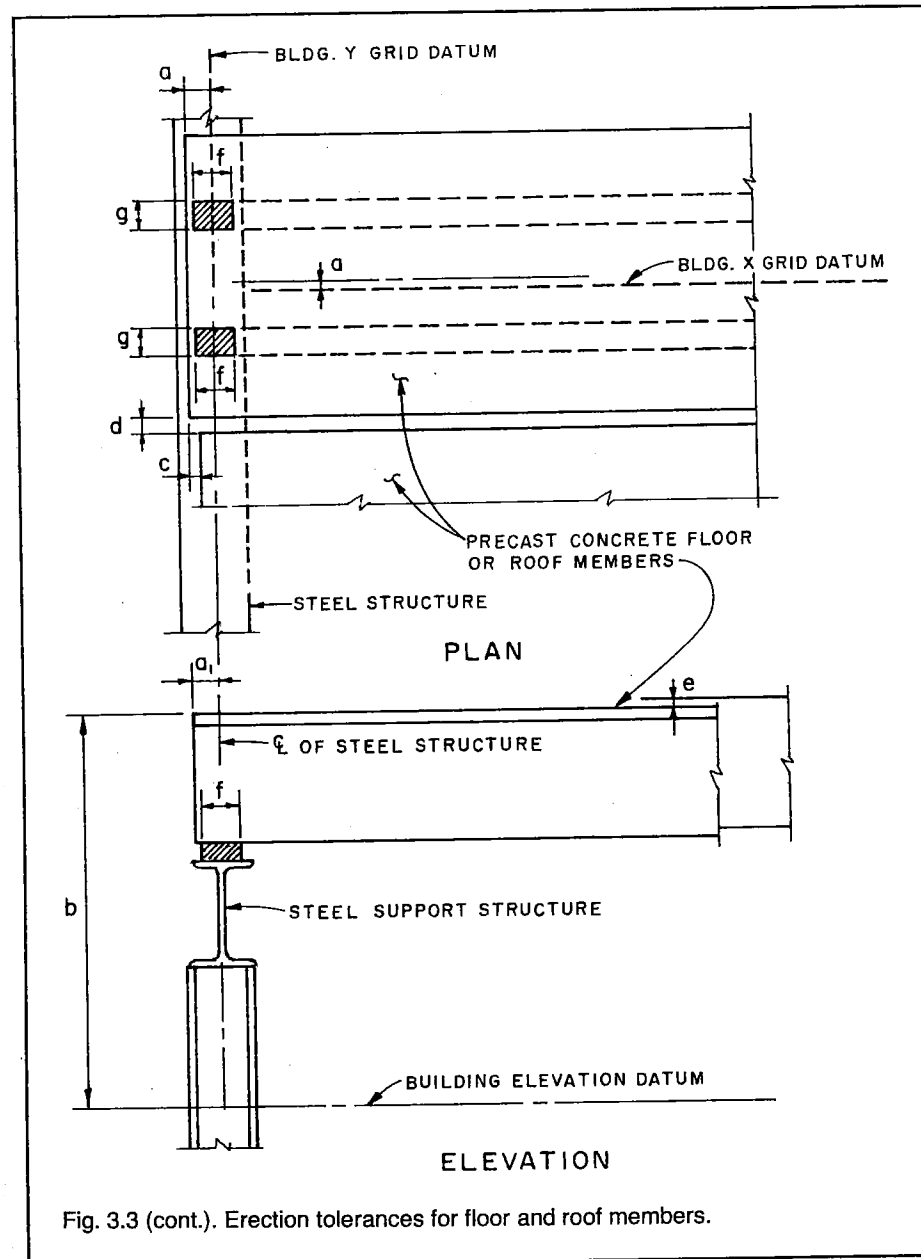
(cont.). Erection tolerances for floor and roof members.
